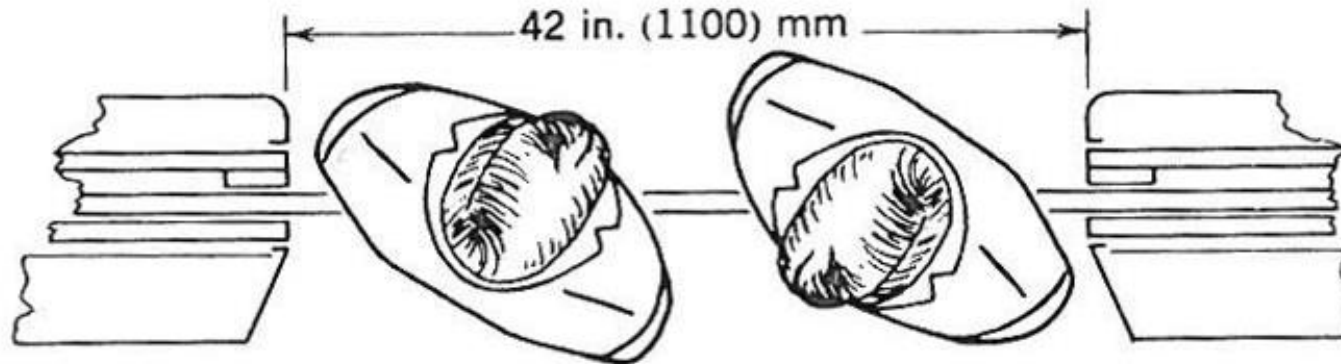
Nominal loading, 3500-lb (1600-kg) “stretcher-shaped” elevator.
